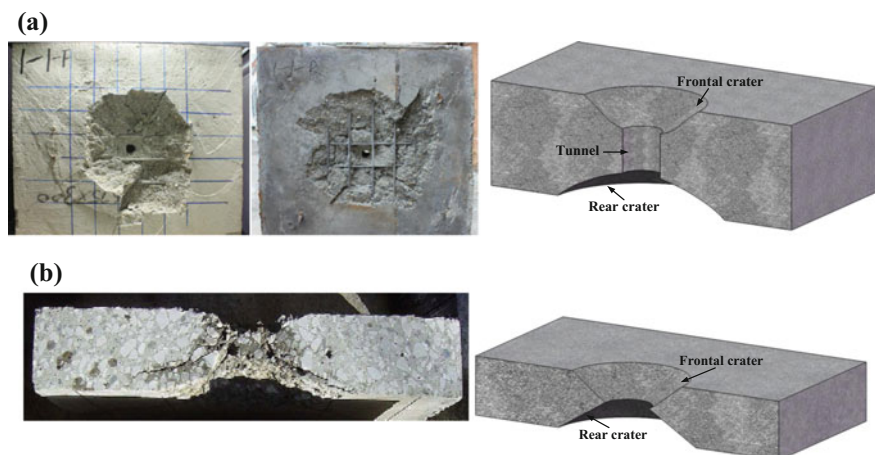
Frontal and rear faces and axial section plane view of a thick concrete slab b thin concrete slab (Wu et al. 2015a; Beppu et al. 2008)
